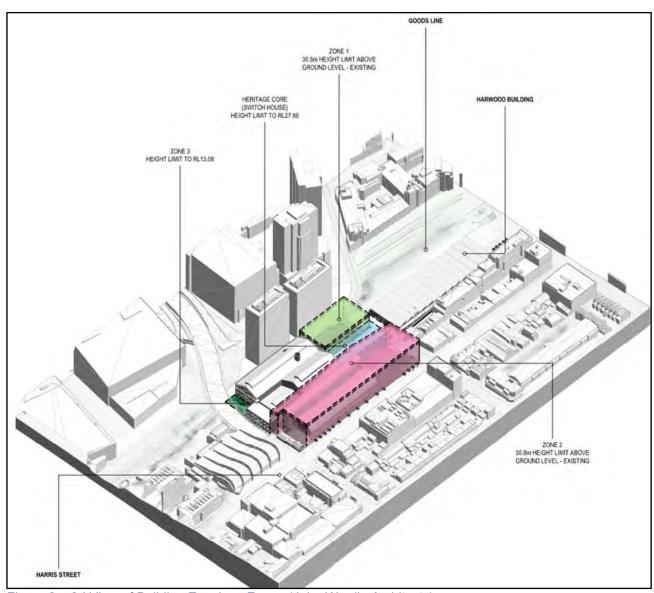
3d View of Building Envelope Zones (John Wardle Architects)
